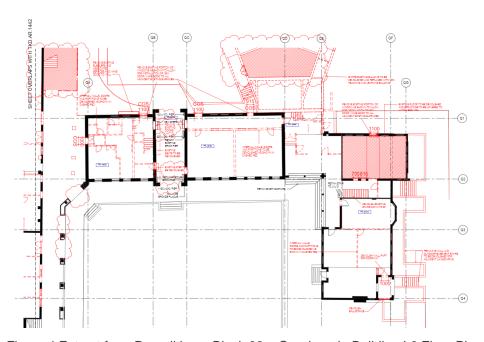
Extract from Demolition – Block 03 – Quadrangle Building L0 Floor Plan showing detailed breakdown of the proposed works to the Quadrangle building.
